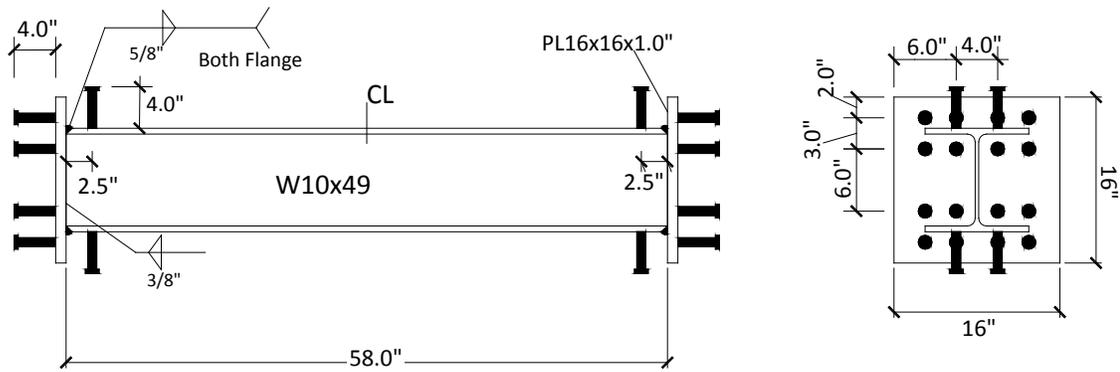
Small piles to be used in the test to connect the upper and lower slabs.
